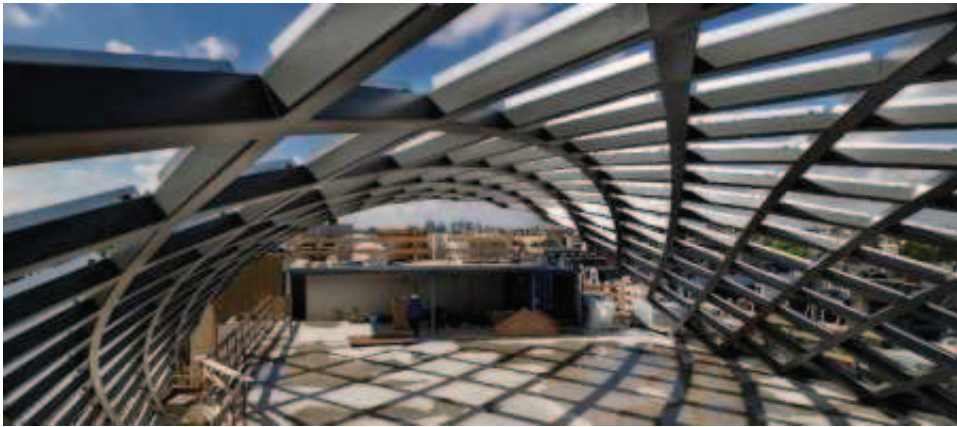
Construction photograph Rokin cylindrical roof, Amsterdam
